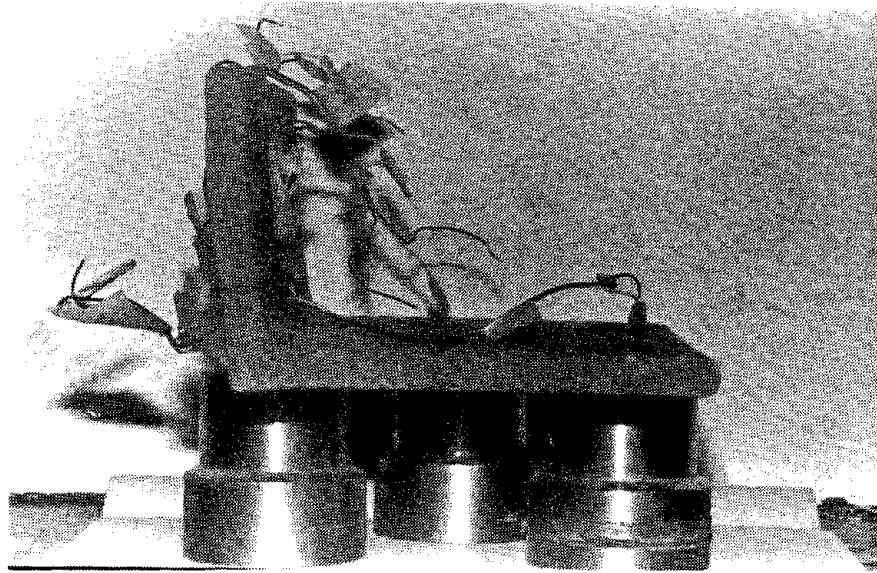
FLANGE ANGLE FROM SPECIMEN 14S2 AFTER TEST
